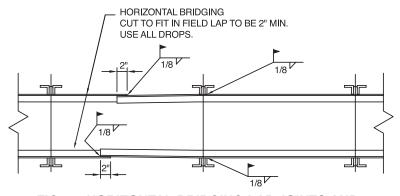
HORIZONTAL BRIDGING LAP JOINTS AND ATTACHMENT TO JOISTS
